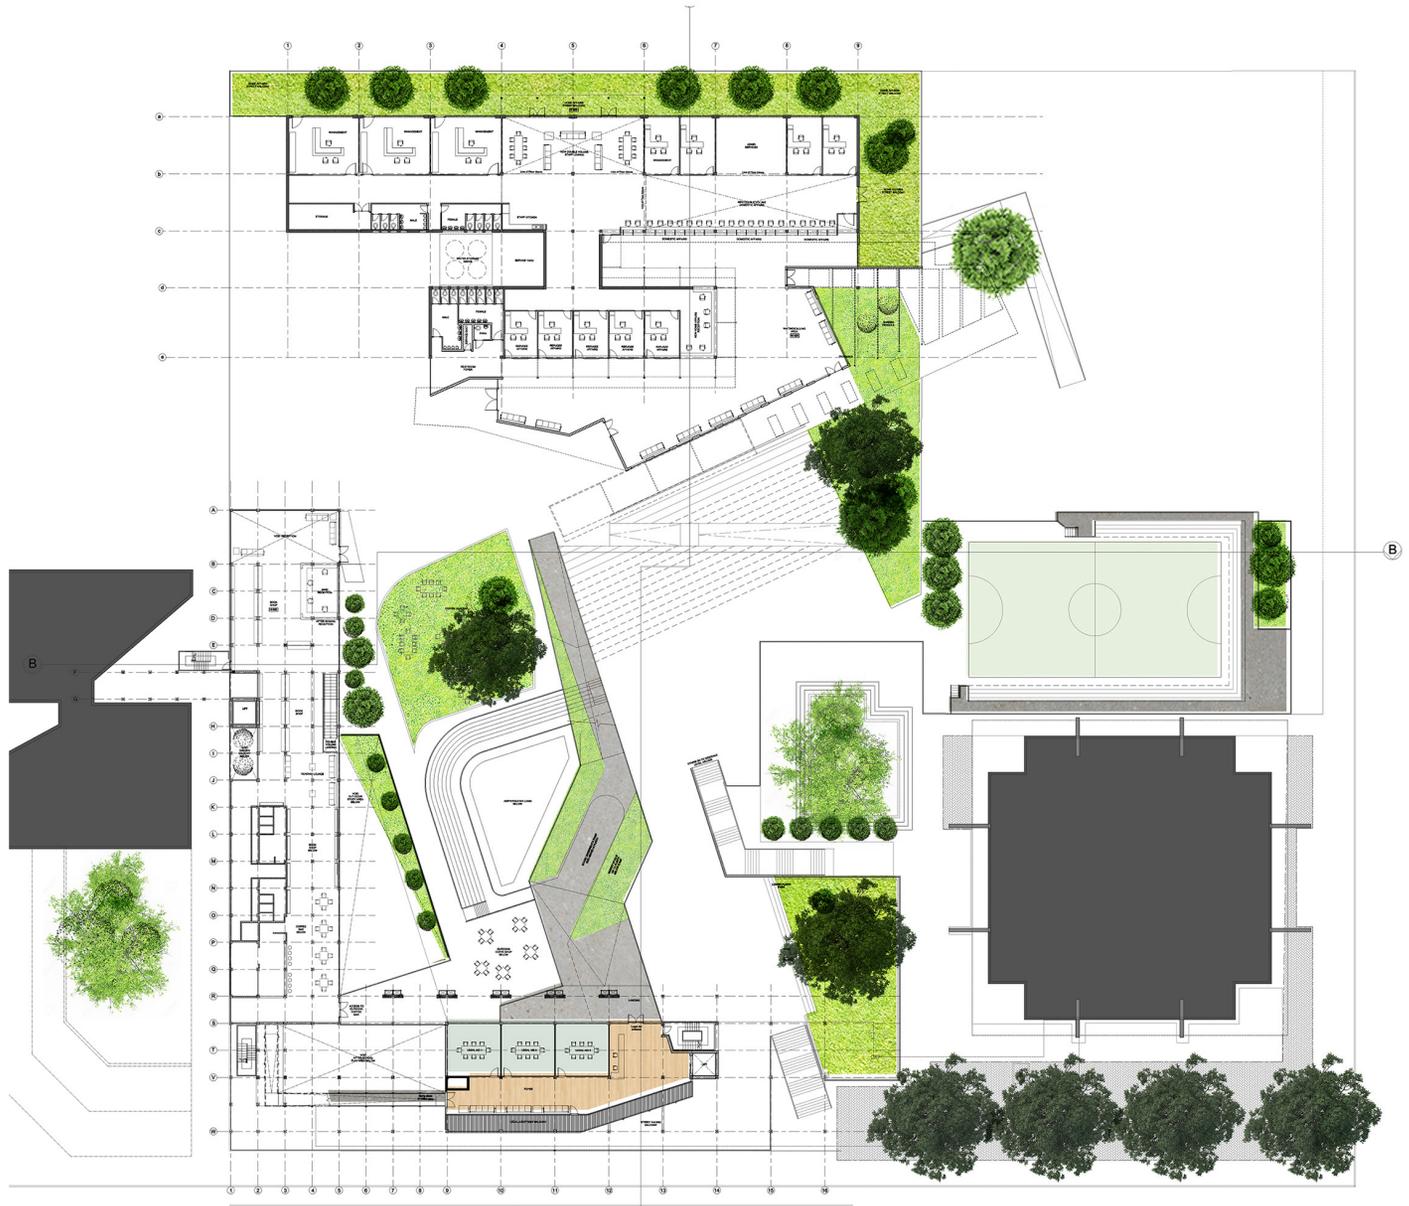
2nd Floor Plan: After School Care (Author 2015)
